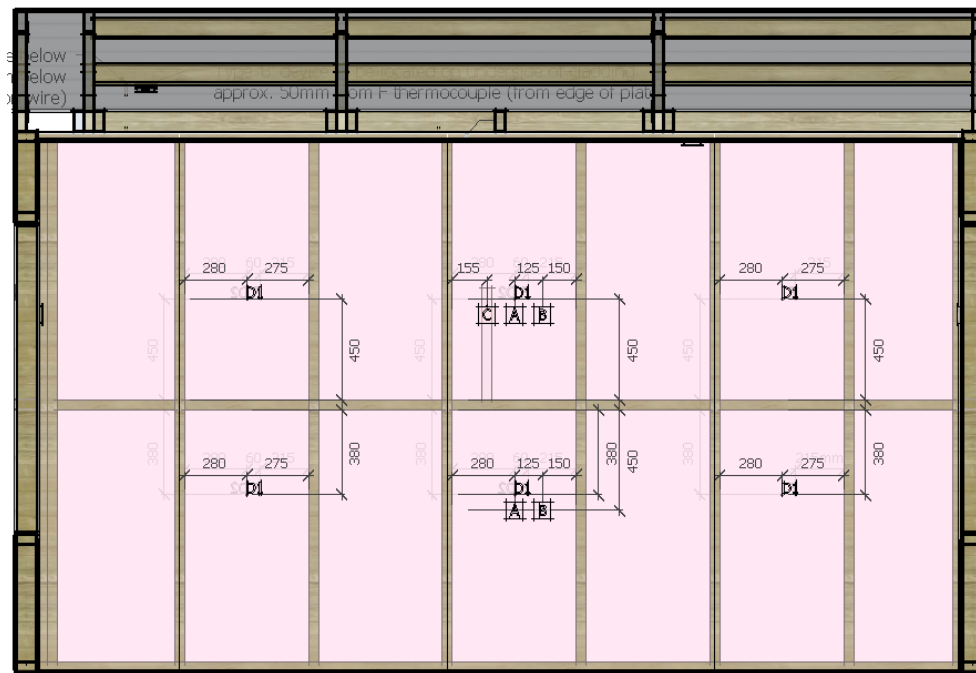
Experiment #2 general layout of thermocouples on fire-rated wall exposed lining (viewed from inside)
